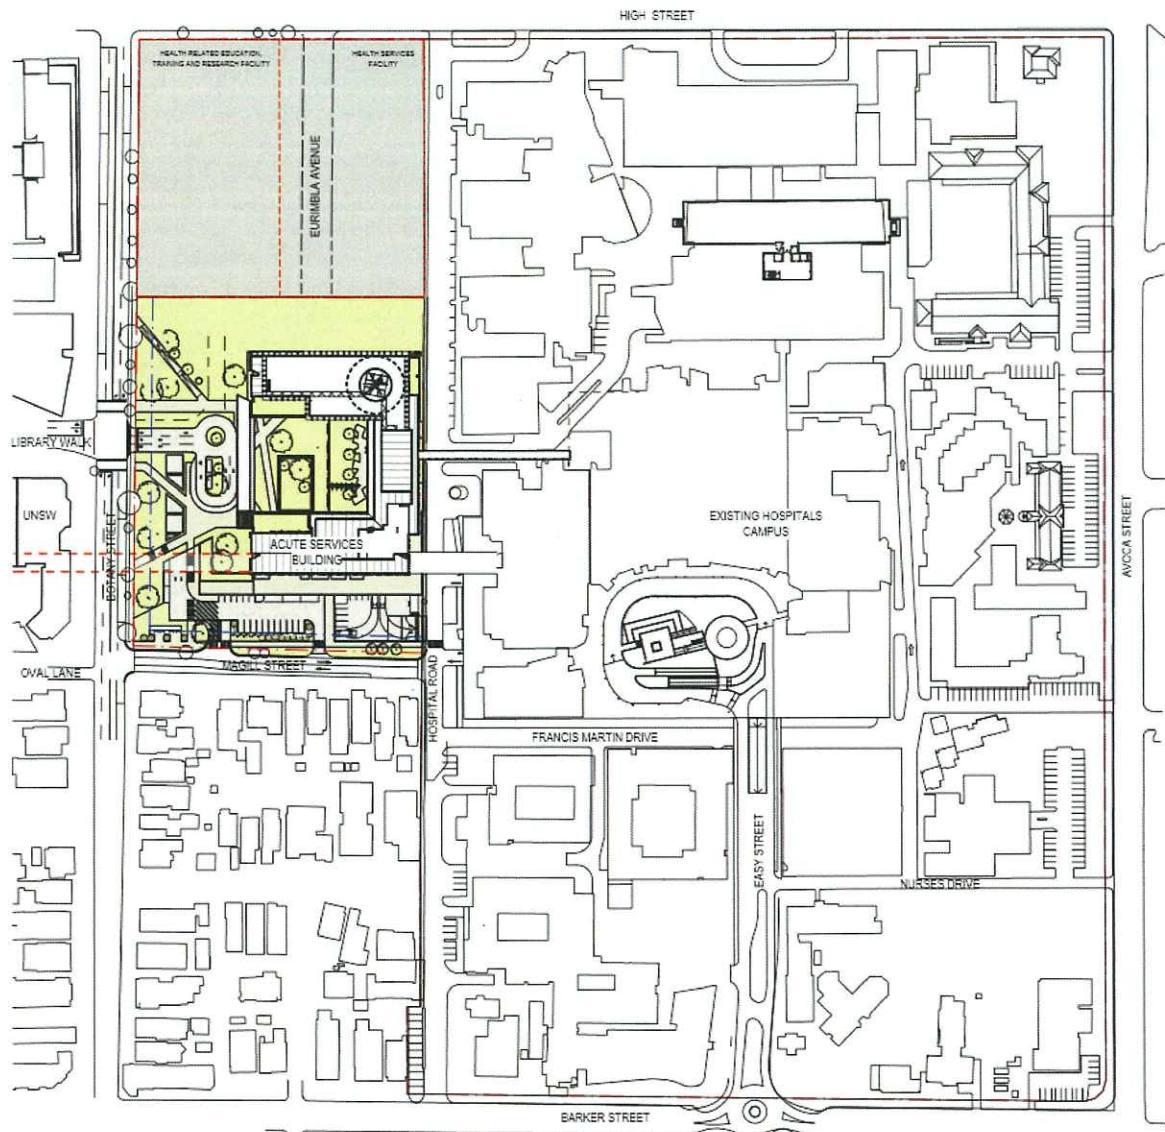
Proposed Campus Site Plan including ASB (Source: BVN, 2018)
